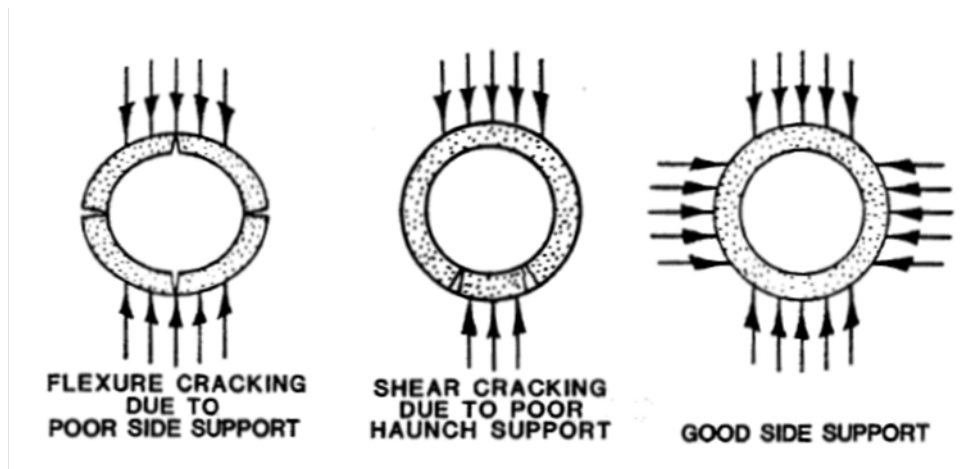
Longitudinal Cracks in Pipe Culvert
